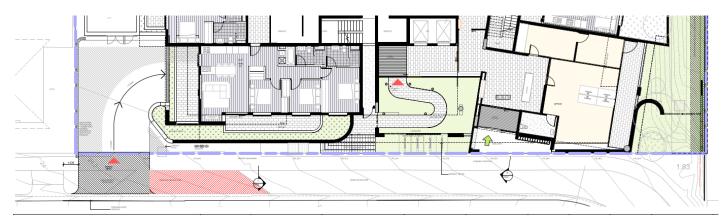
Extract of the ground floor plan showing the front setback, relative to Abbott Street
